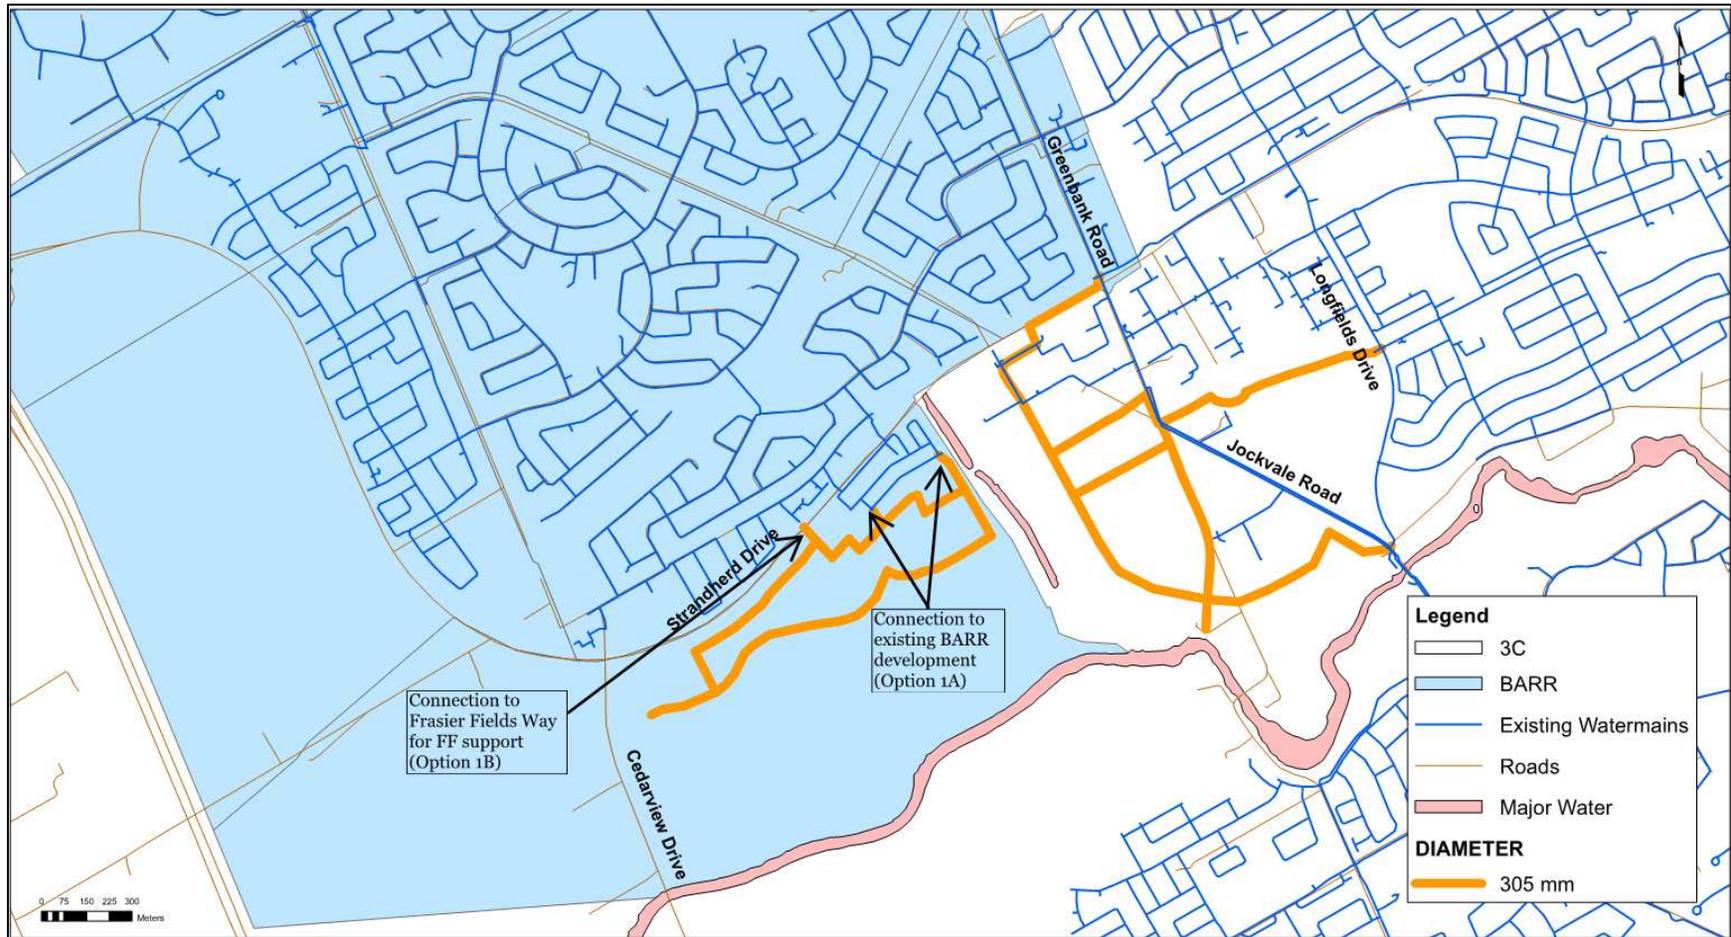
Proposed Pipe Layout Pre Zone Reconfiguration – Scenarios 1A and 1B
